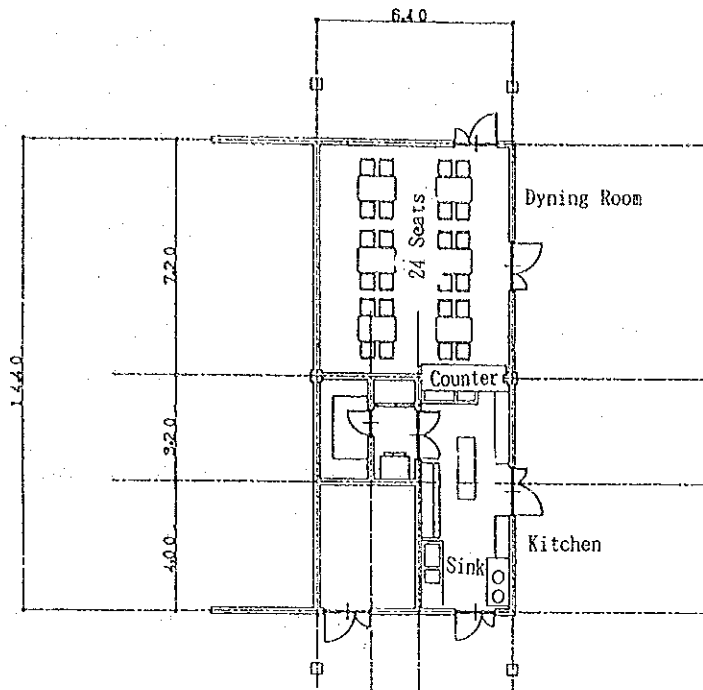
Floor Plan for the Dining Room/Kitchen
